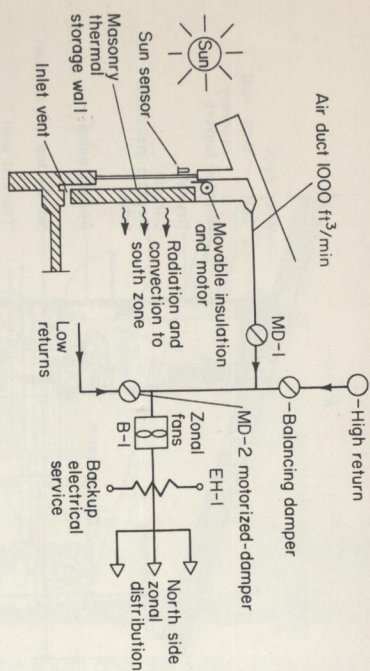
Section of thermal-storage-wall section of the Gunnison County Airport showing aperture, storage wall, movable insulation, wall vent, and heat-recovery duct. (Courtesy of Phil Tabb Architects, Boulder, Colo.)
